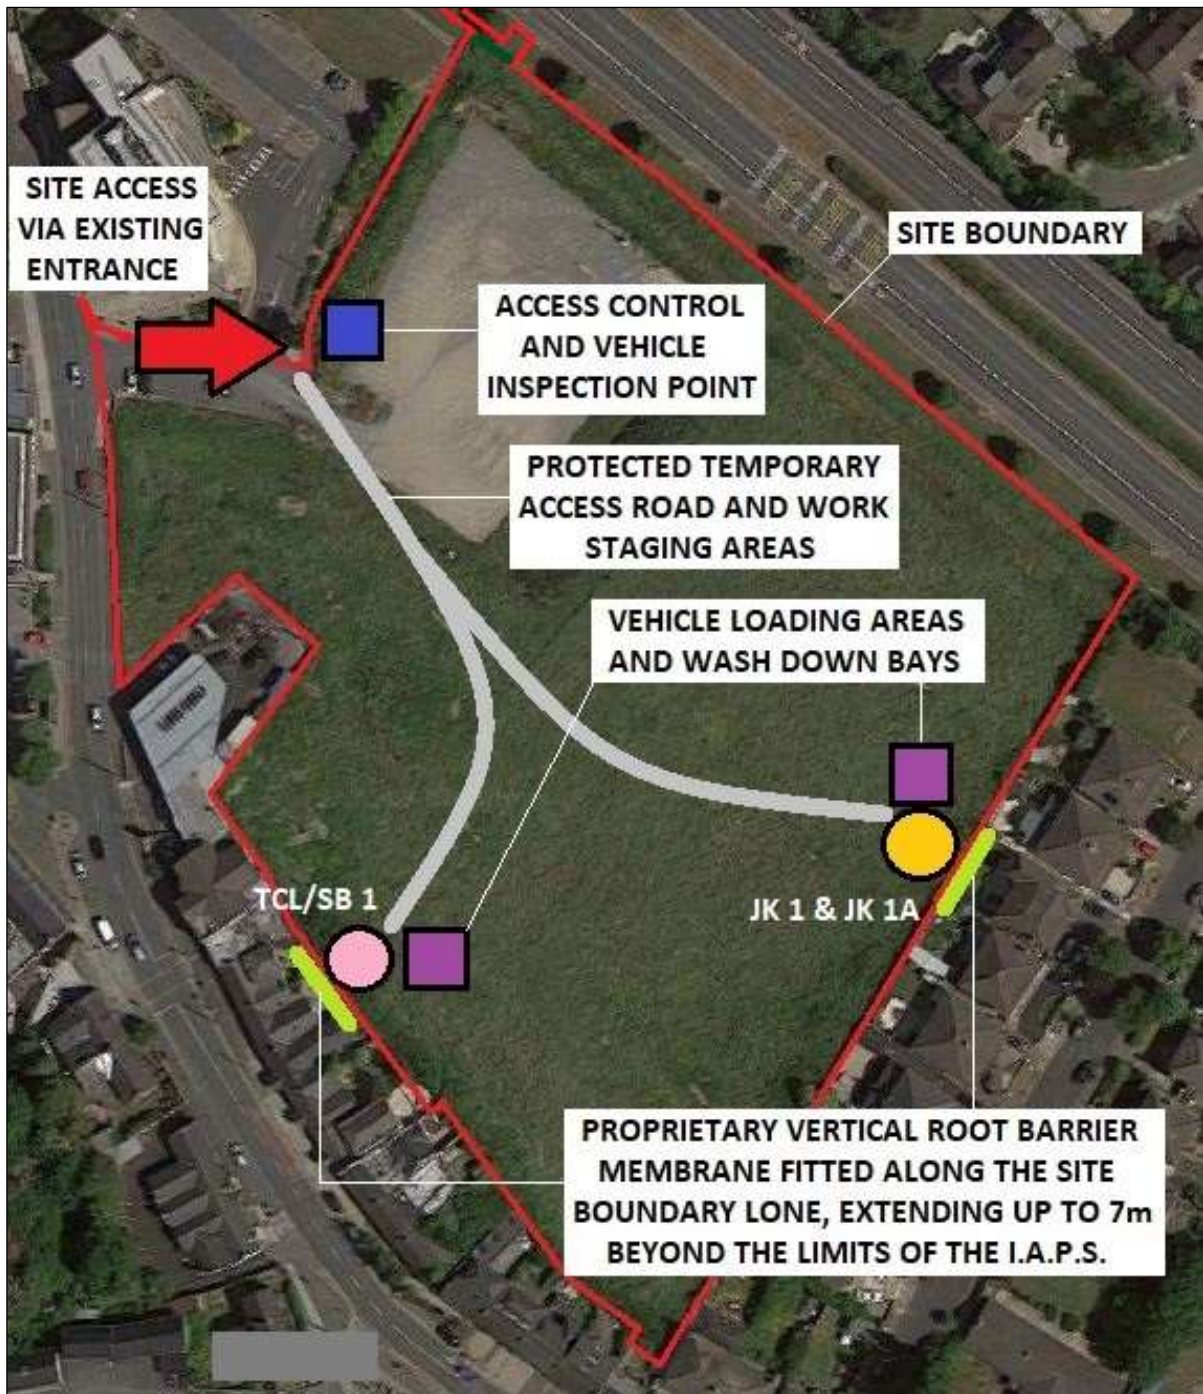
Aerial Site Layout showing schematic set up of works areas
